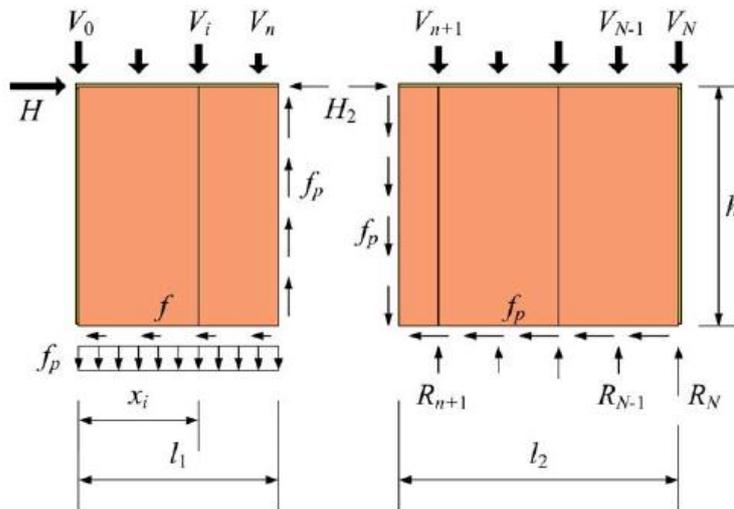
A schematic view of the vertical and horizontal line loads acting on a wall that the anchoring needs to resist. (Källsner & Girhammar 2008)
